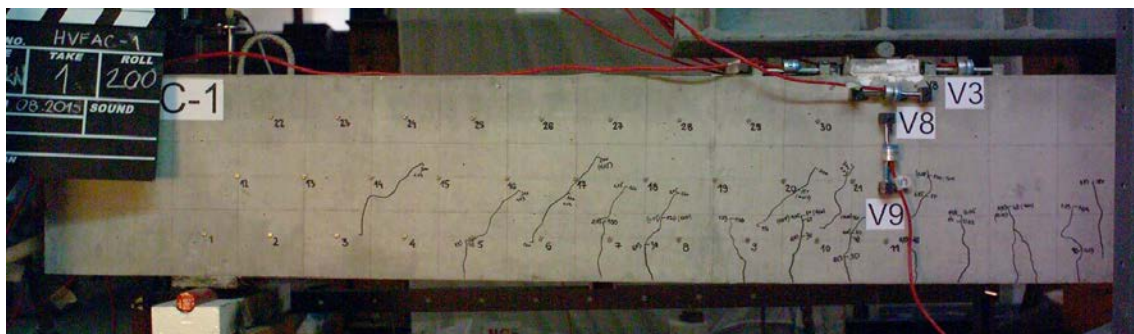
Crack pattern on the front side of HVFAC-1 beam just before failure
